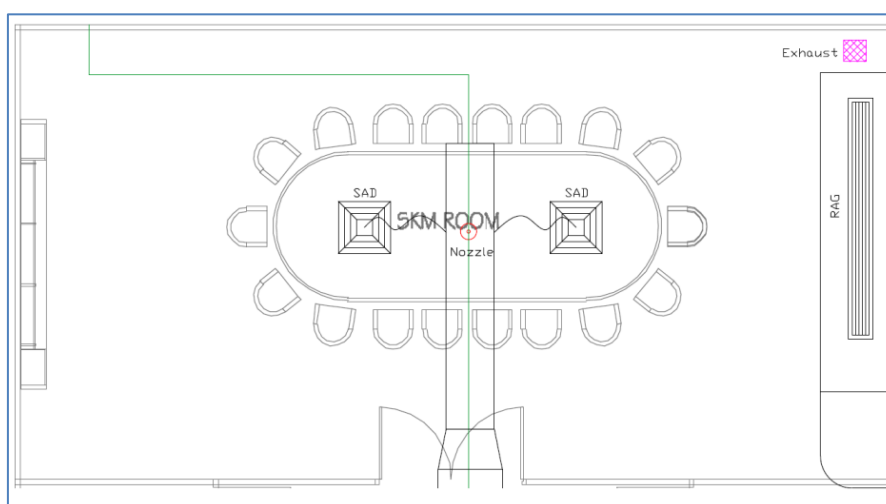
Meeting room plans, air conditioning, and nozzle placement
